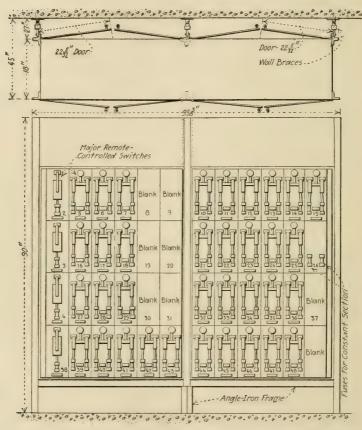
Front view of remote board with doors removed, for the Indiana Theatre, Terre Haute, ind. (Frank Adam Electric Co.) This shows the switchboard manufacturers shop drawing.
